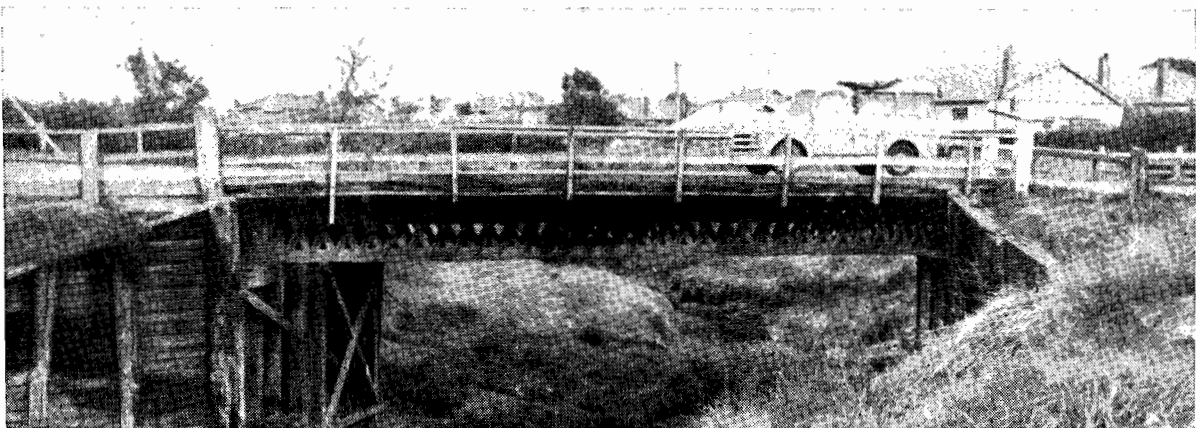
Old bridge over Moonee Ponds Creek in Albion Street.
